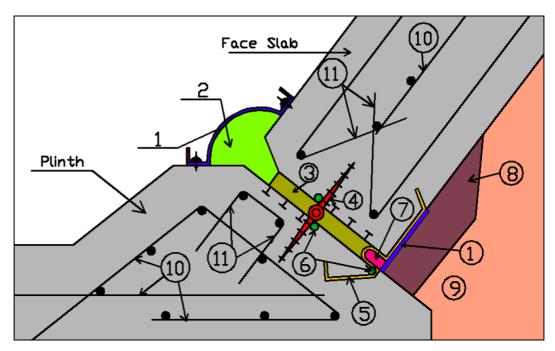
Perimeter joint for Salvajina Dam (Hedien, 2005-a)
